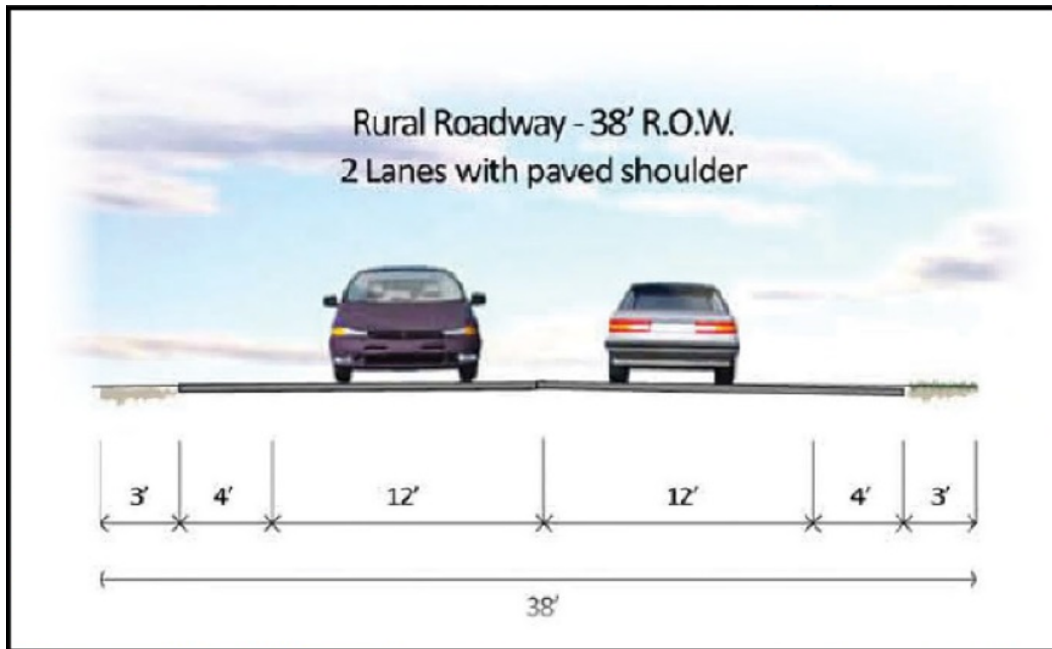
Roadway Cross Section Considered to Date – Colusa County Rural Roadway
